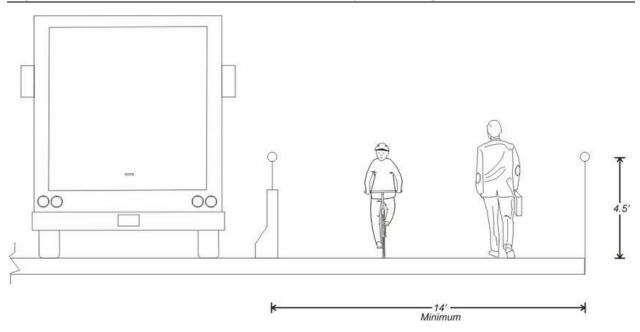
Minimum Standard Multi-Use Pathway on a Bridge Structure
